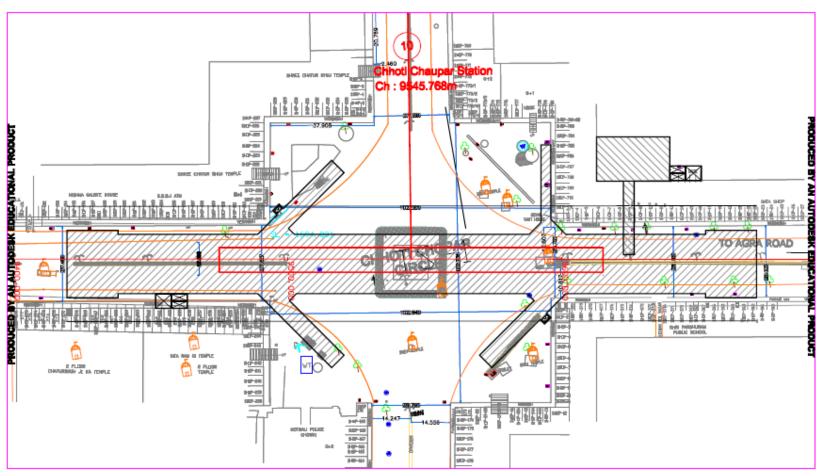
General Layout Plan (Chhoti Choupar Metro Station)
